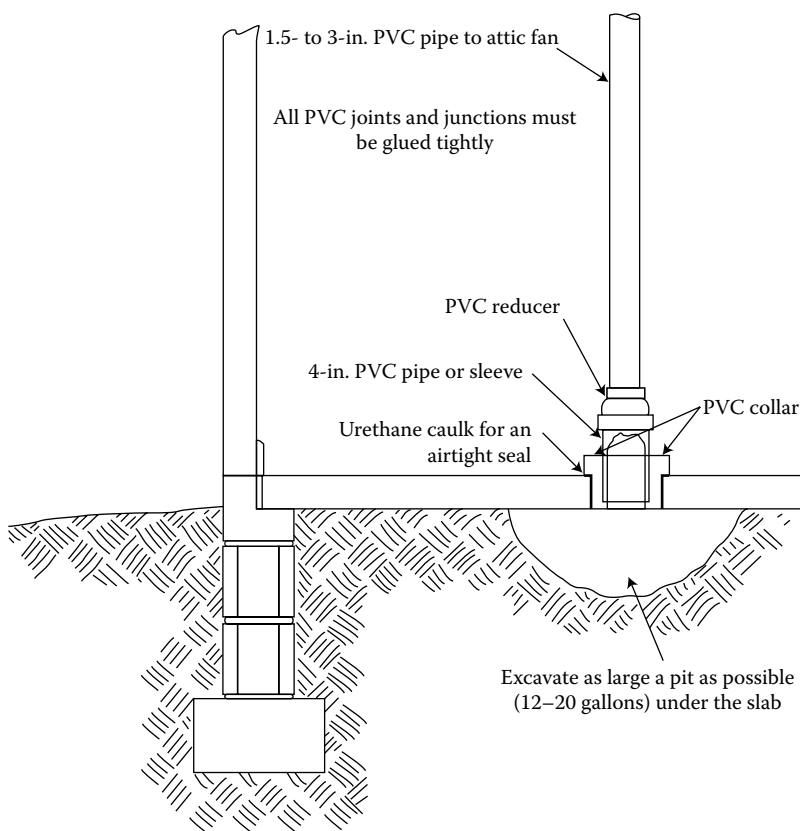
Typical interior suction point. (Adapted from U.S. EPA, *Sub-Slab Depressurization for Low-Permeability Fill Material—Design and Installation of a Home Radon Reduction System*, EPA/625/6-91/029, U.S. Environmental Protection Agency, Washington, DC, July 1991.)
